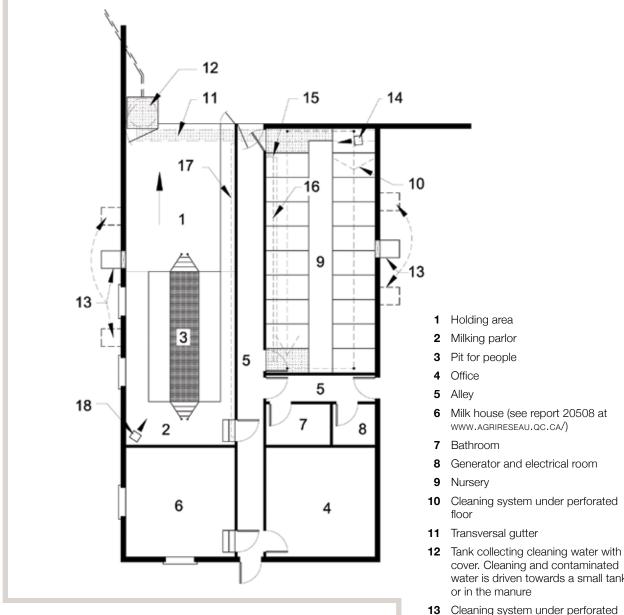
Barn floor plan for nursery, milk house, milking parlor and office area
